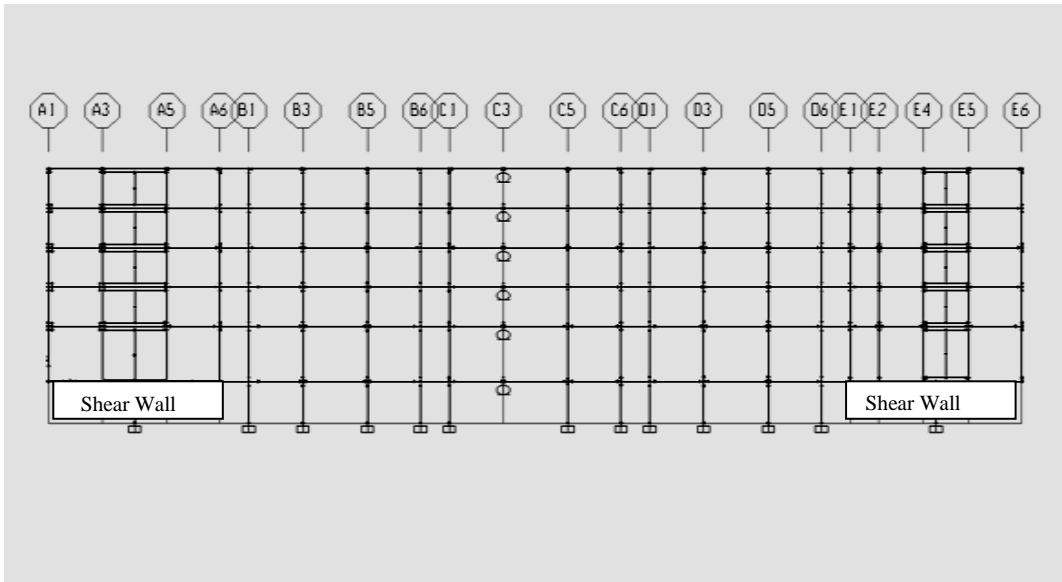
Structural model of the school building retrofitted with the proposed method
